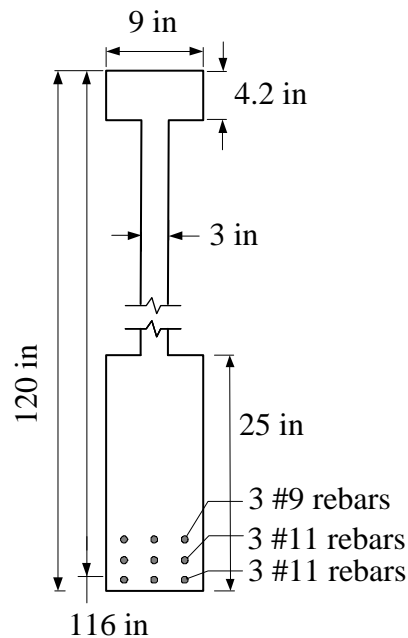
Section dimension and arrangement of longitudinal reinforcement steel rebars for section UHP/St60 120I-3
